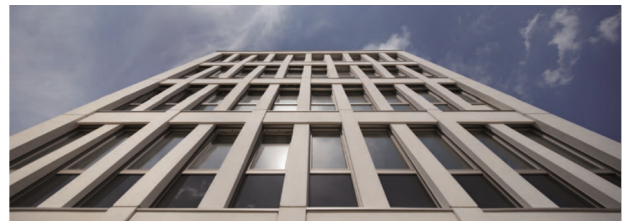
Precast concrete sandwich panels for use as a façade [5].
